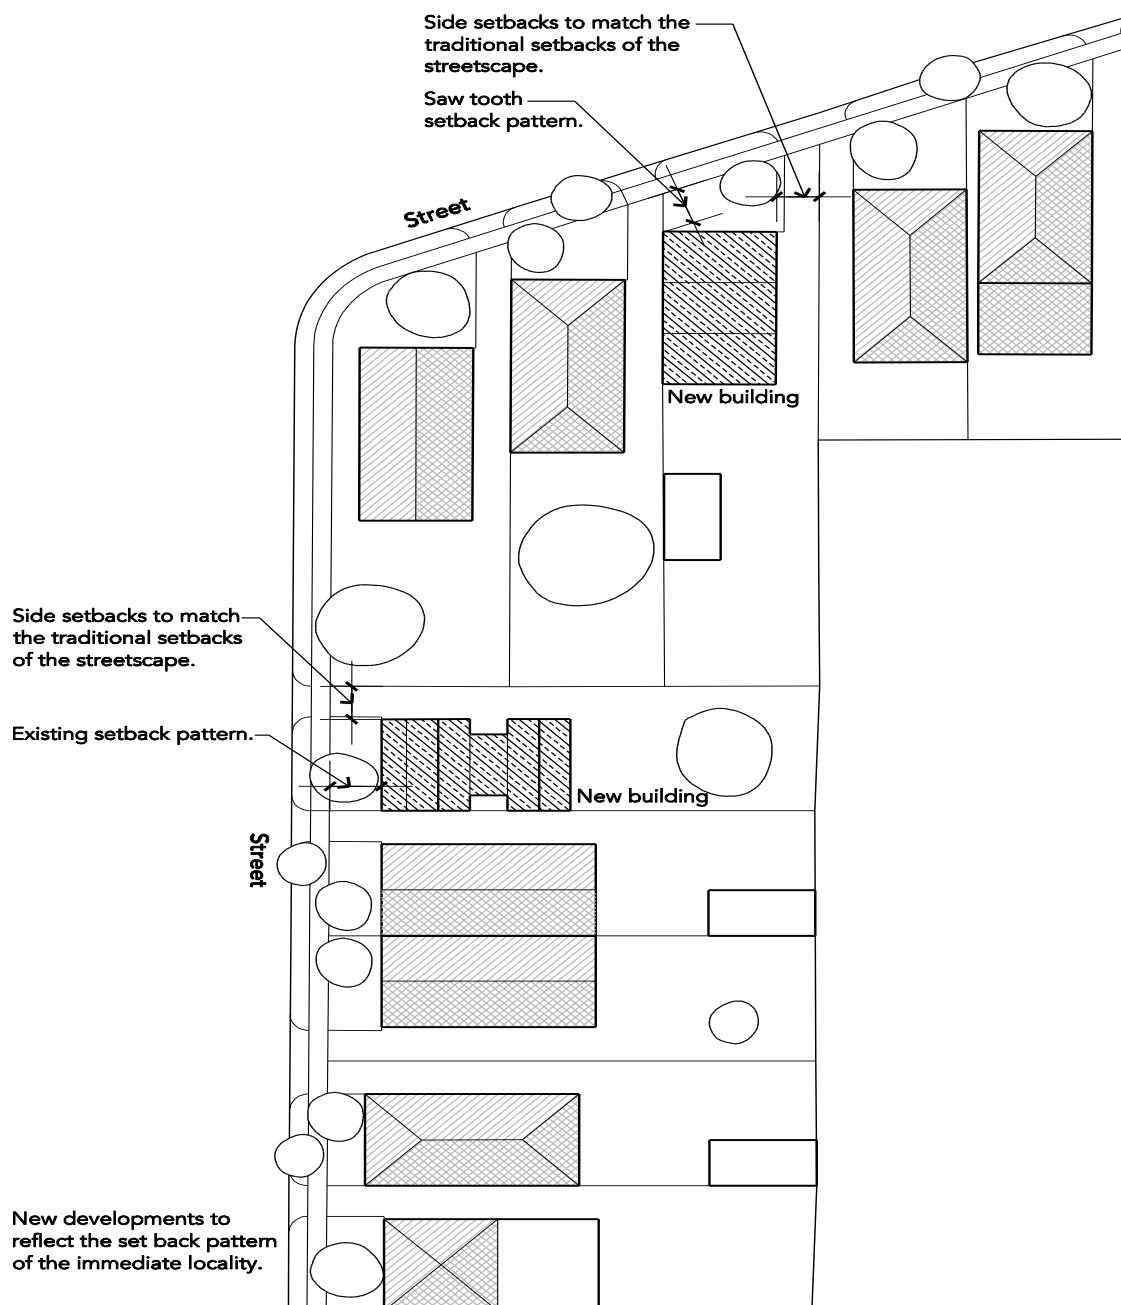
Site plans illustrating existing setback patterns and compatible new developments – *Griffiths Architects 2012.
